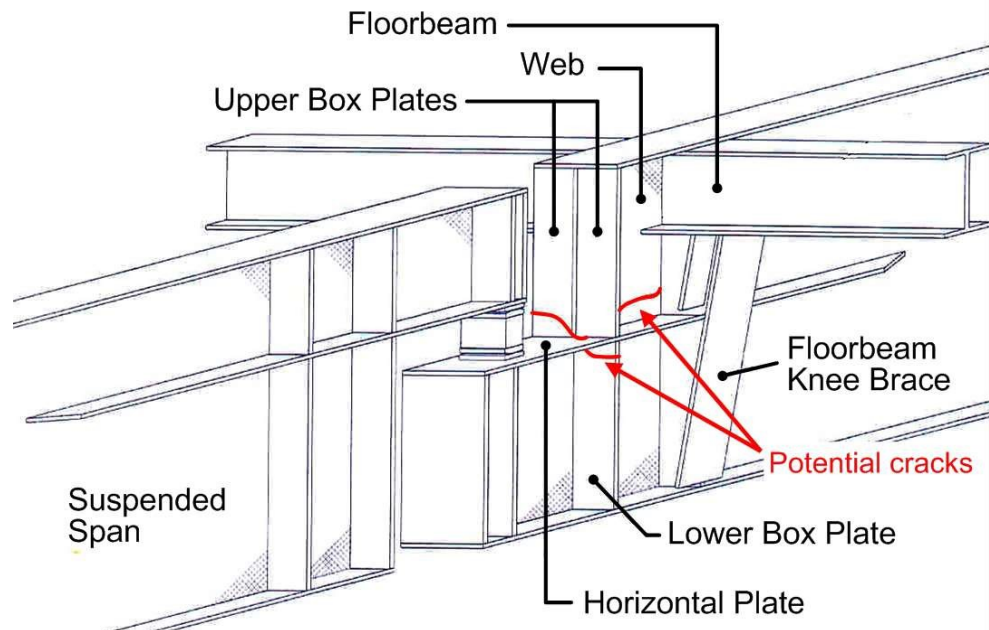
Potential Crack Formation for Cantilever Suspended Span (Potential Cracks Shown in Red)
